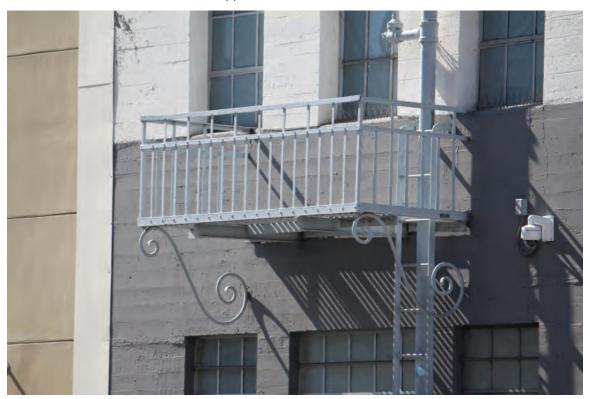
Original steel fire-escape balcony at the southern end of the east facade. This shield is also used in two locations on the upper east facade.
